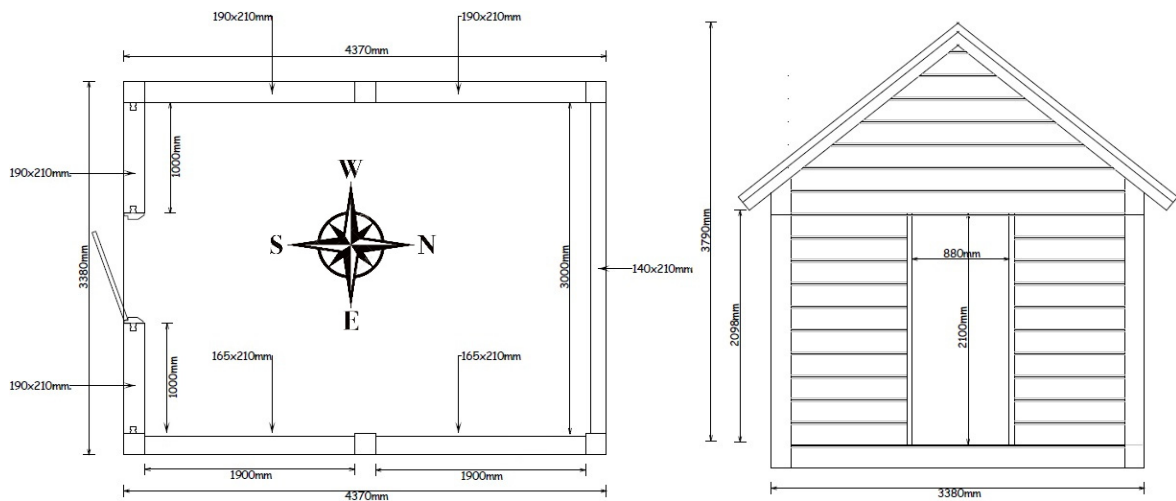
Schematic drawing of the wooden cabin. The test object is the North facing external wall (wall without door).
